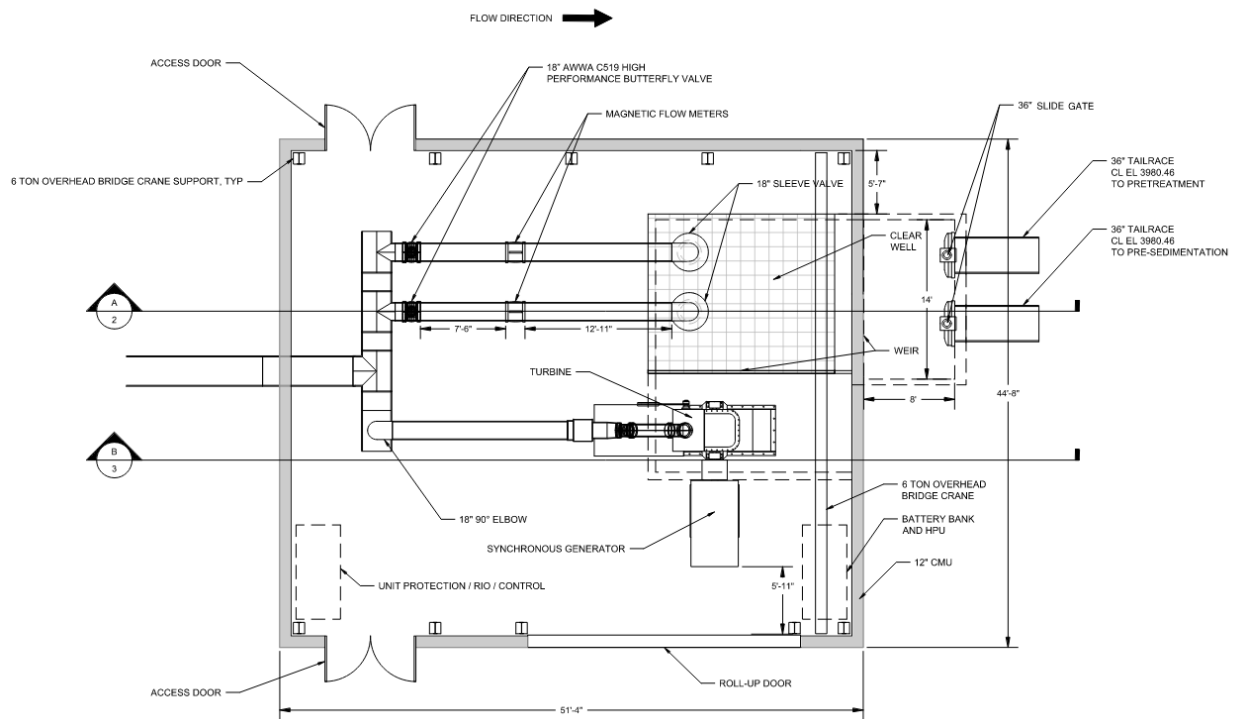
Plan View Building Layout of Proposed Outback In-conduit Hydropower Facility
